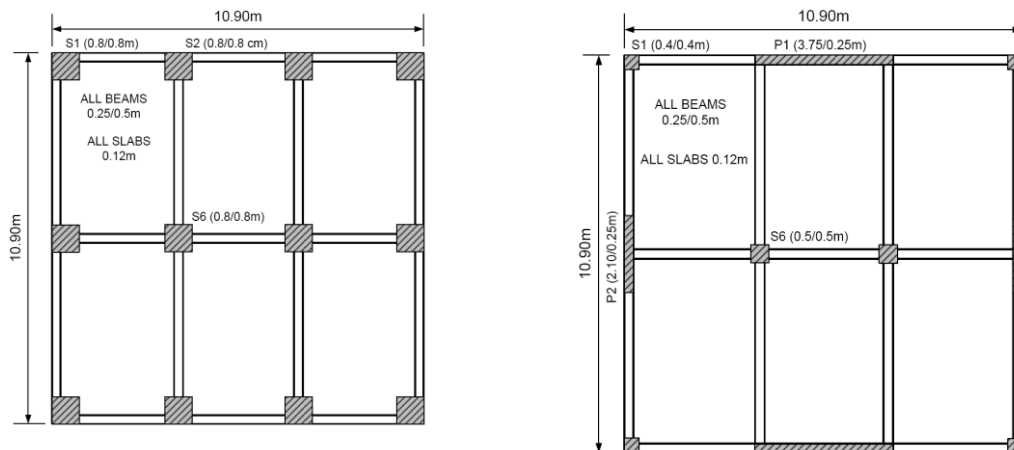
First floor plans of generic 10 storey reinforced concrete frame and dual system buildings
